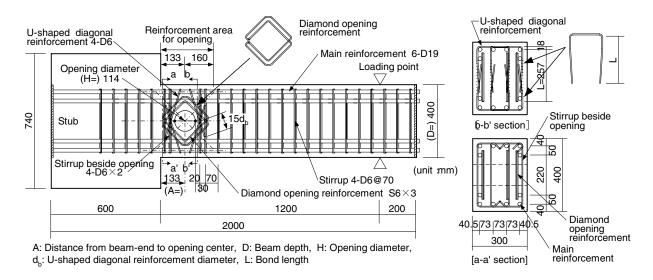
Specimen shape, dimension, and reinforcement arrangement (Example of L6-5-M6)
